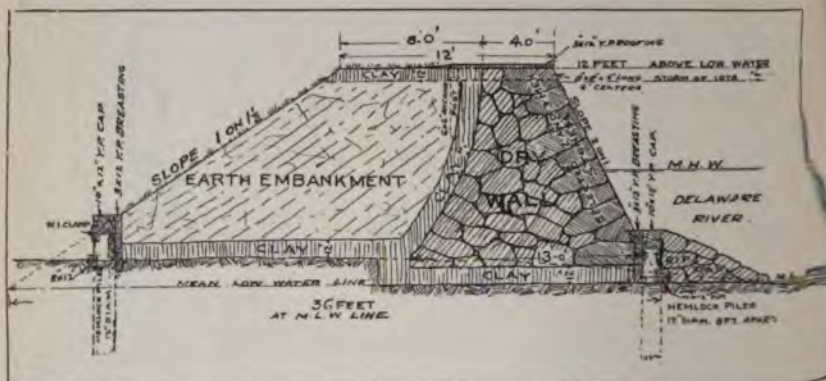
DELAWARE RIVER WALL BETWEEN VENANGO STREET AND HEDLEY STREET.
